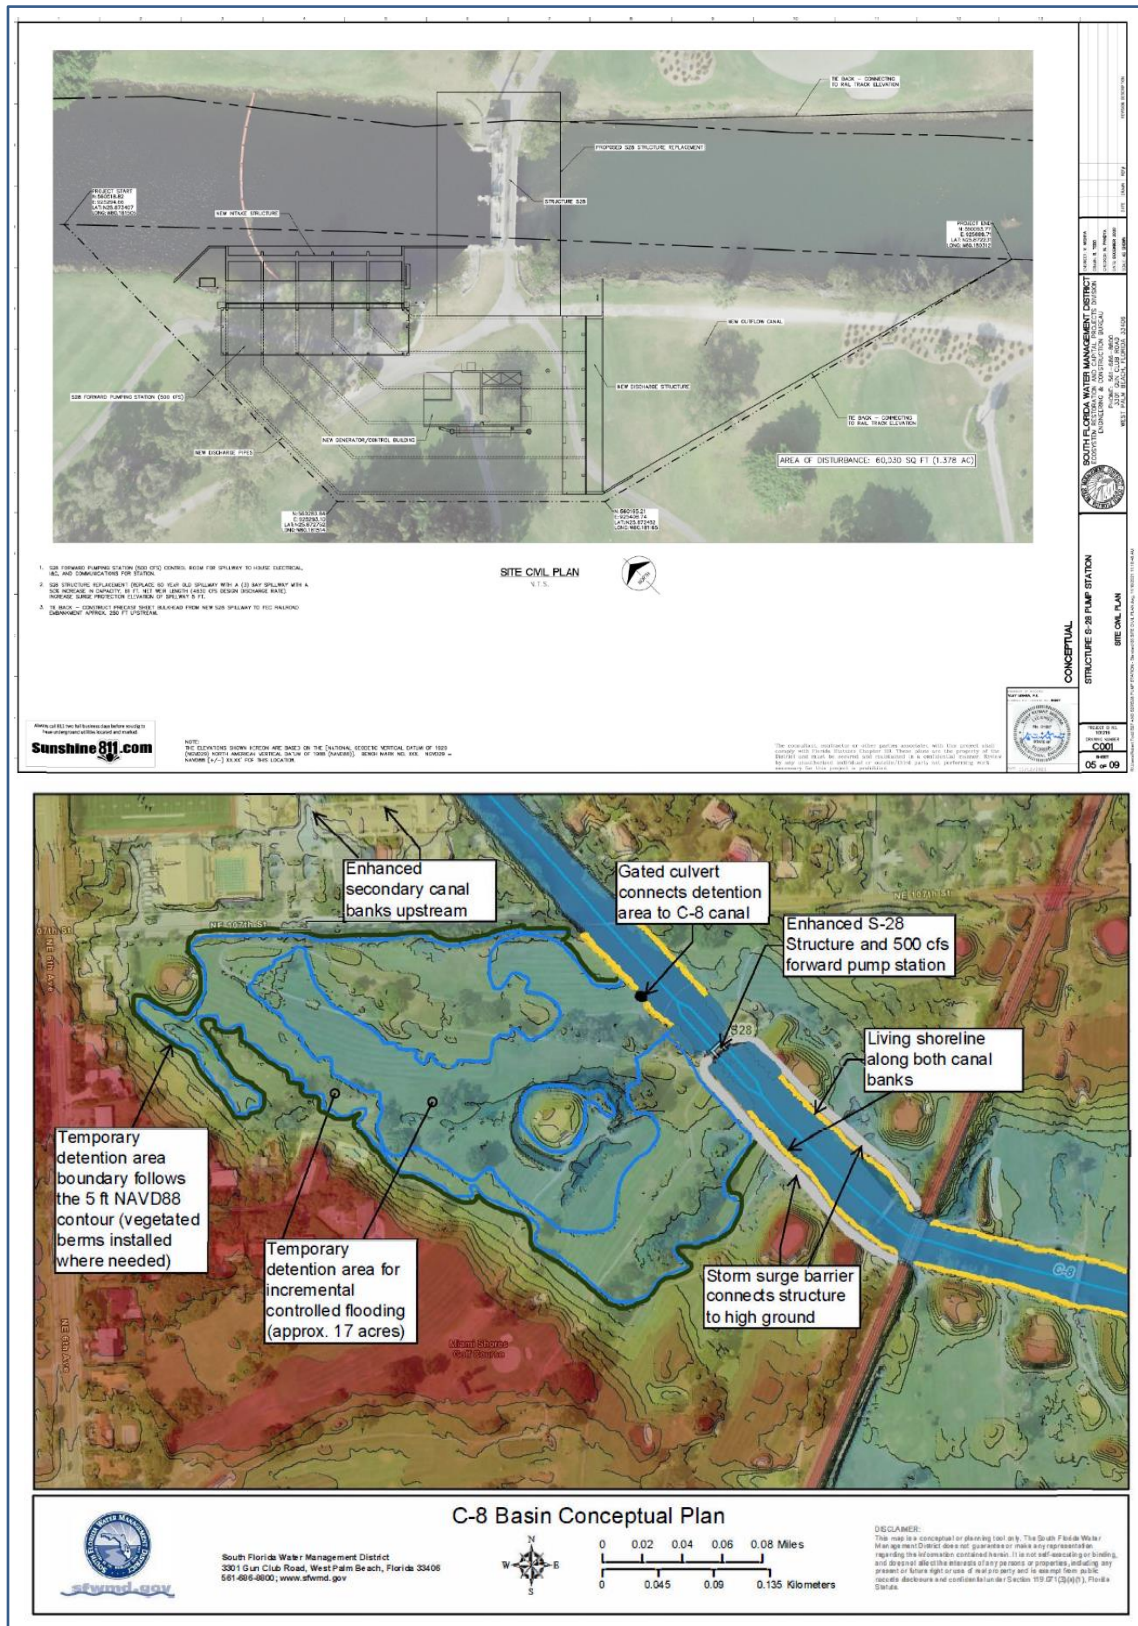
Site plan for S-28 Structure features and conceptual plan for the C-8 Basin.
